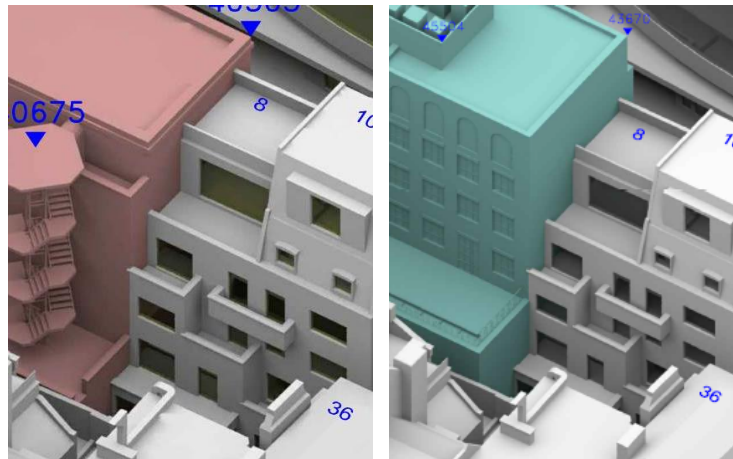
Existing (left) and proposed (right) relationship between site and 8 – 10 Parker Street (GF and 1st floor) and Flats 1-6 (Market House, 12-16) above. 18-24 Parker Street extend off to the right of image
